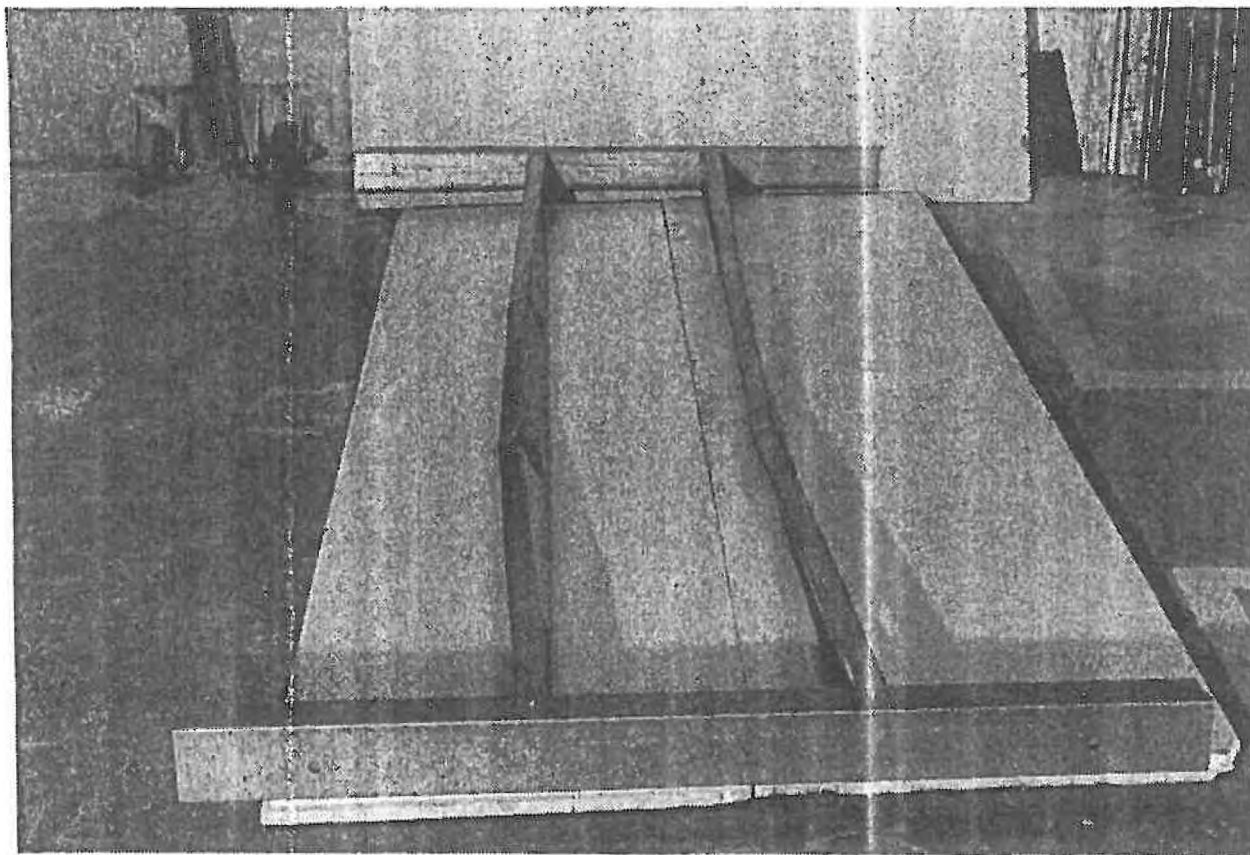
Photograph Showing Typical Failure of an 18 Gauge Specimen - Series 5
